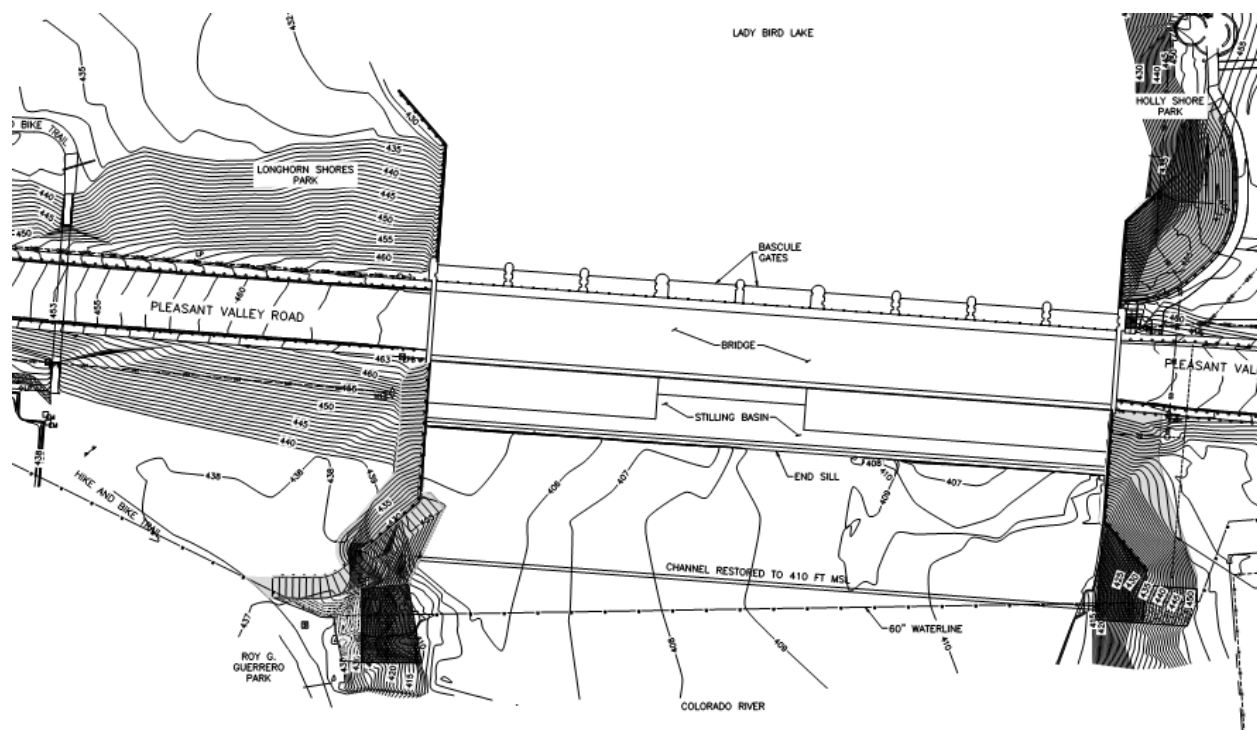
Existing Site Plan of Longhorn Dam (source FNI 2012)
